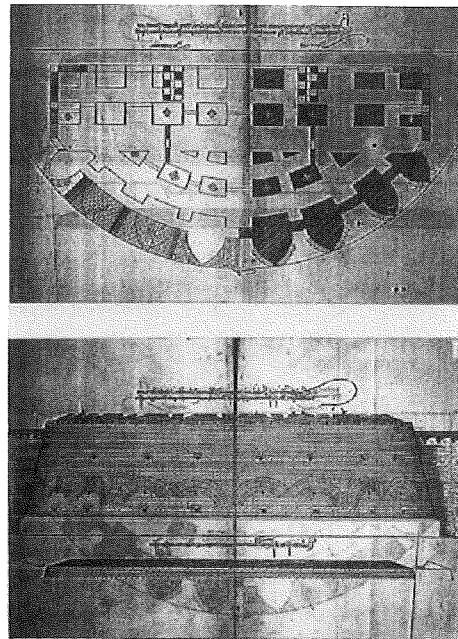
Dürer, Ground track and elevation of a bastion *Etliche underricht, zu befestigung der Stett, Schloss, und flecken*, 1527. The first drawing of a building using section-plane-elevation representation
